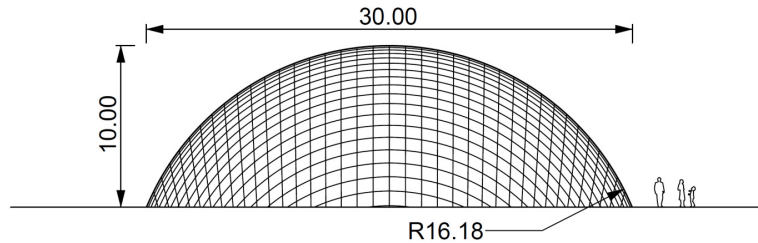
Span and pitch of case study test dome made from a single layer of 50x50mm timber laths.
